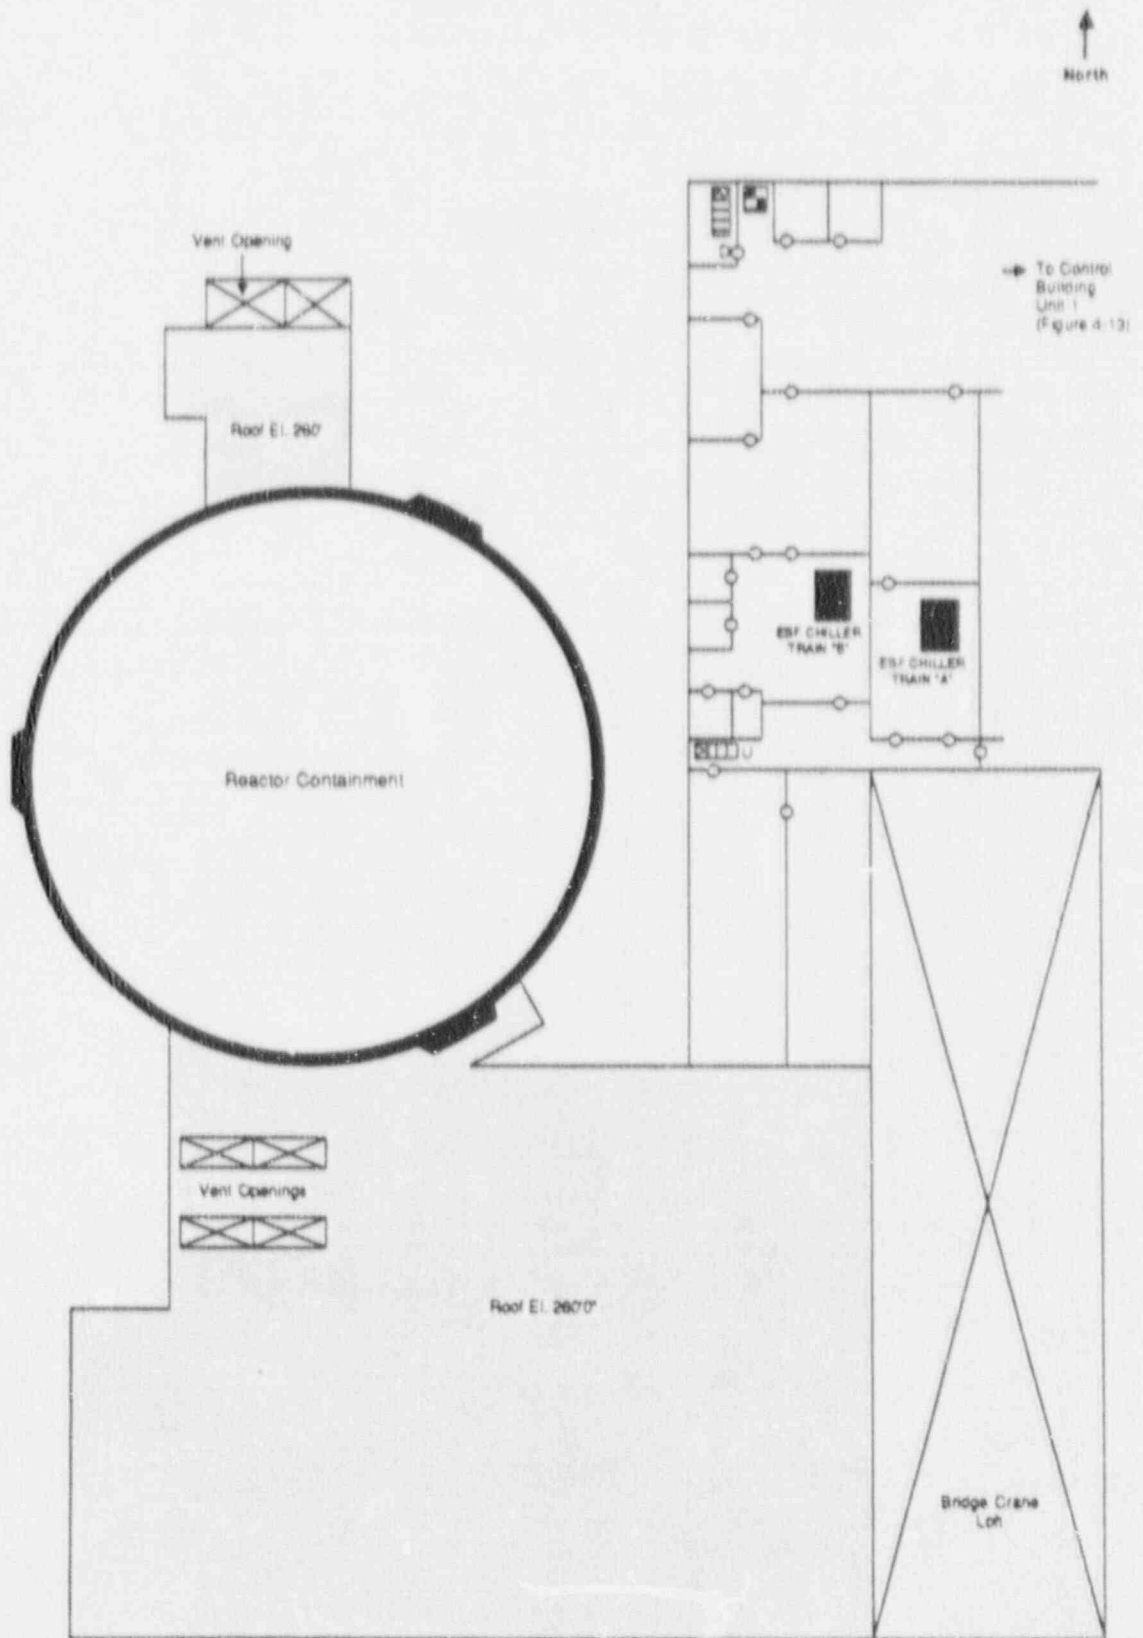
Vogtle 2 Reactor Containment, Control Building, and Fuel Handling Building, Level 3 (Elevation 260'-0")
